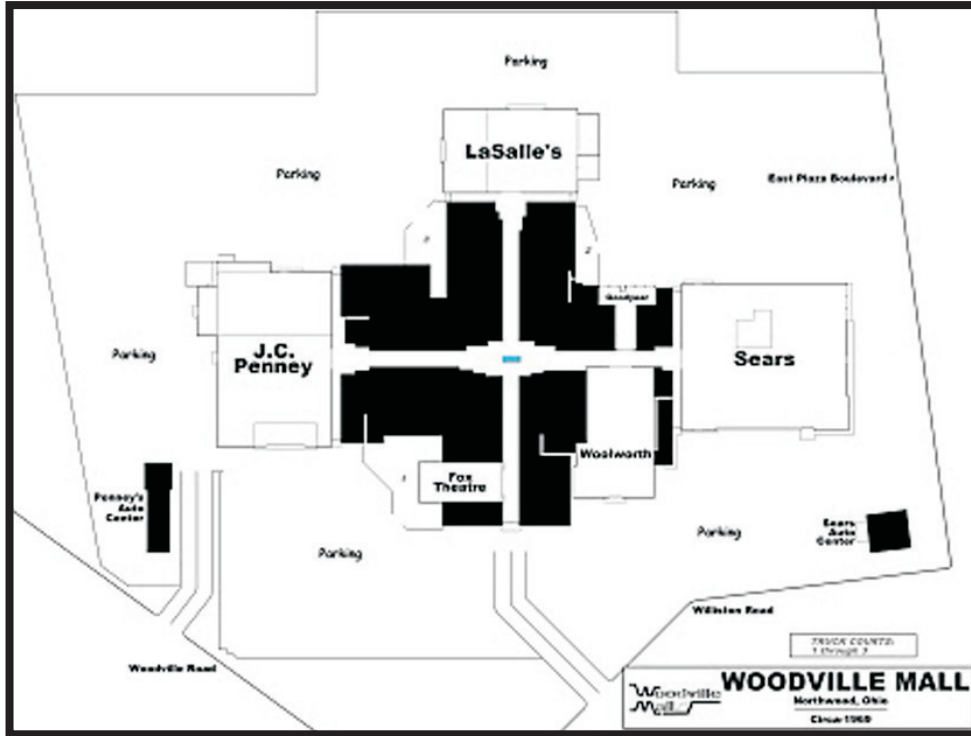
Site plan for Woodville Mall in Northwood (Mall Hall of Fame 2008b).
